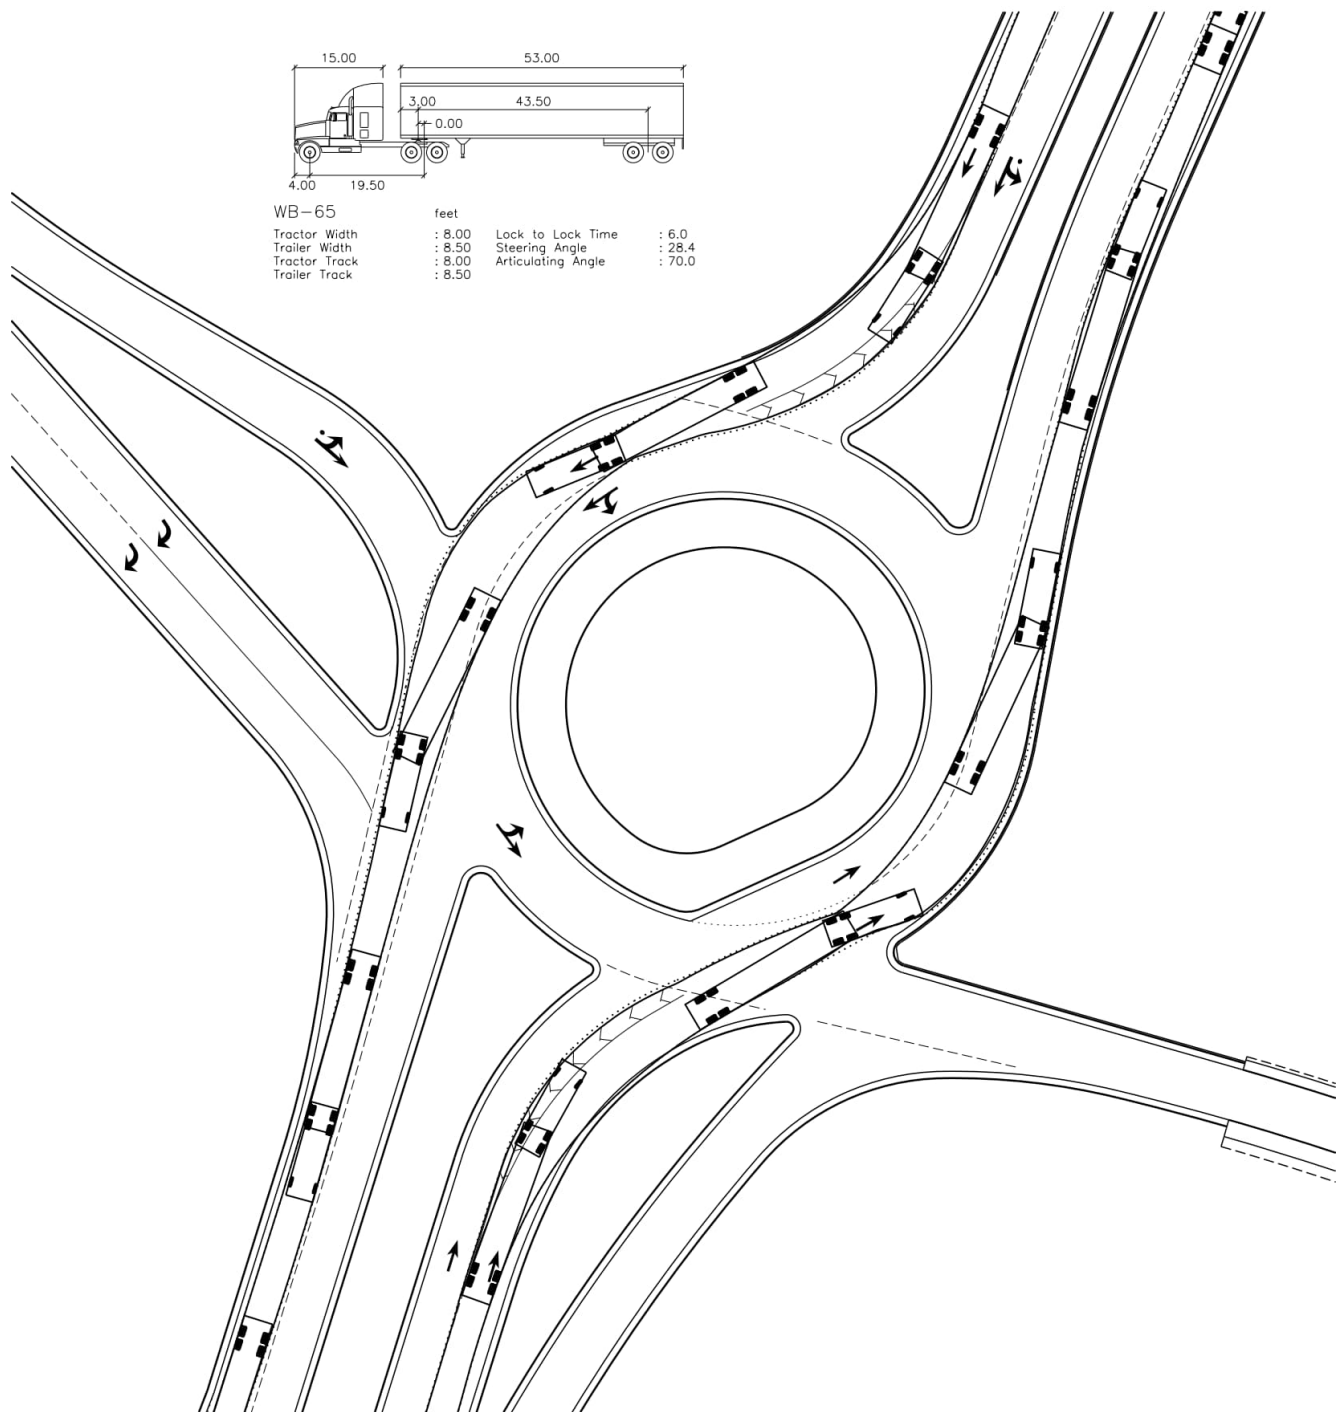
Case 2 Roundabout Design (6-ft gore pavement marking between lanes)
